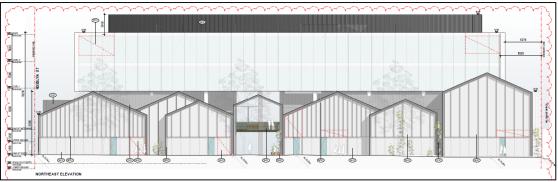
North-east Elevation (Drawing No. TP02.02)
